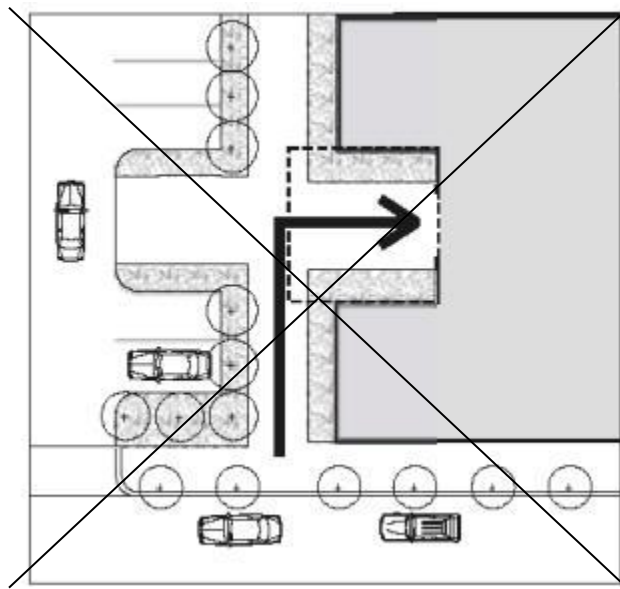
(B): ~~Example of connection of building entrance which is not located on a street but has a clear pedestrian walkway to it.~~
